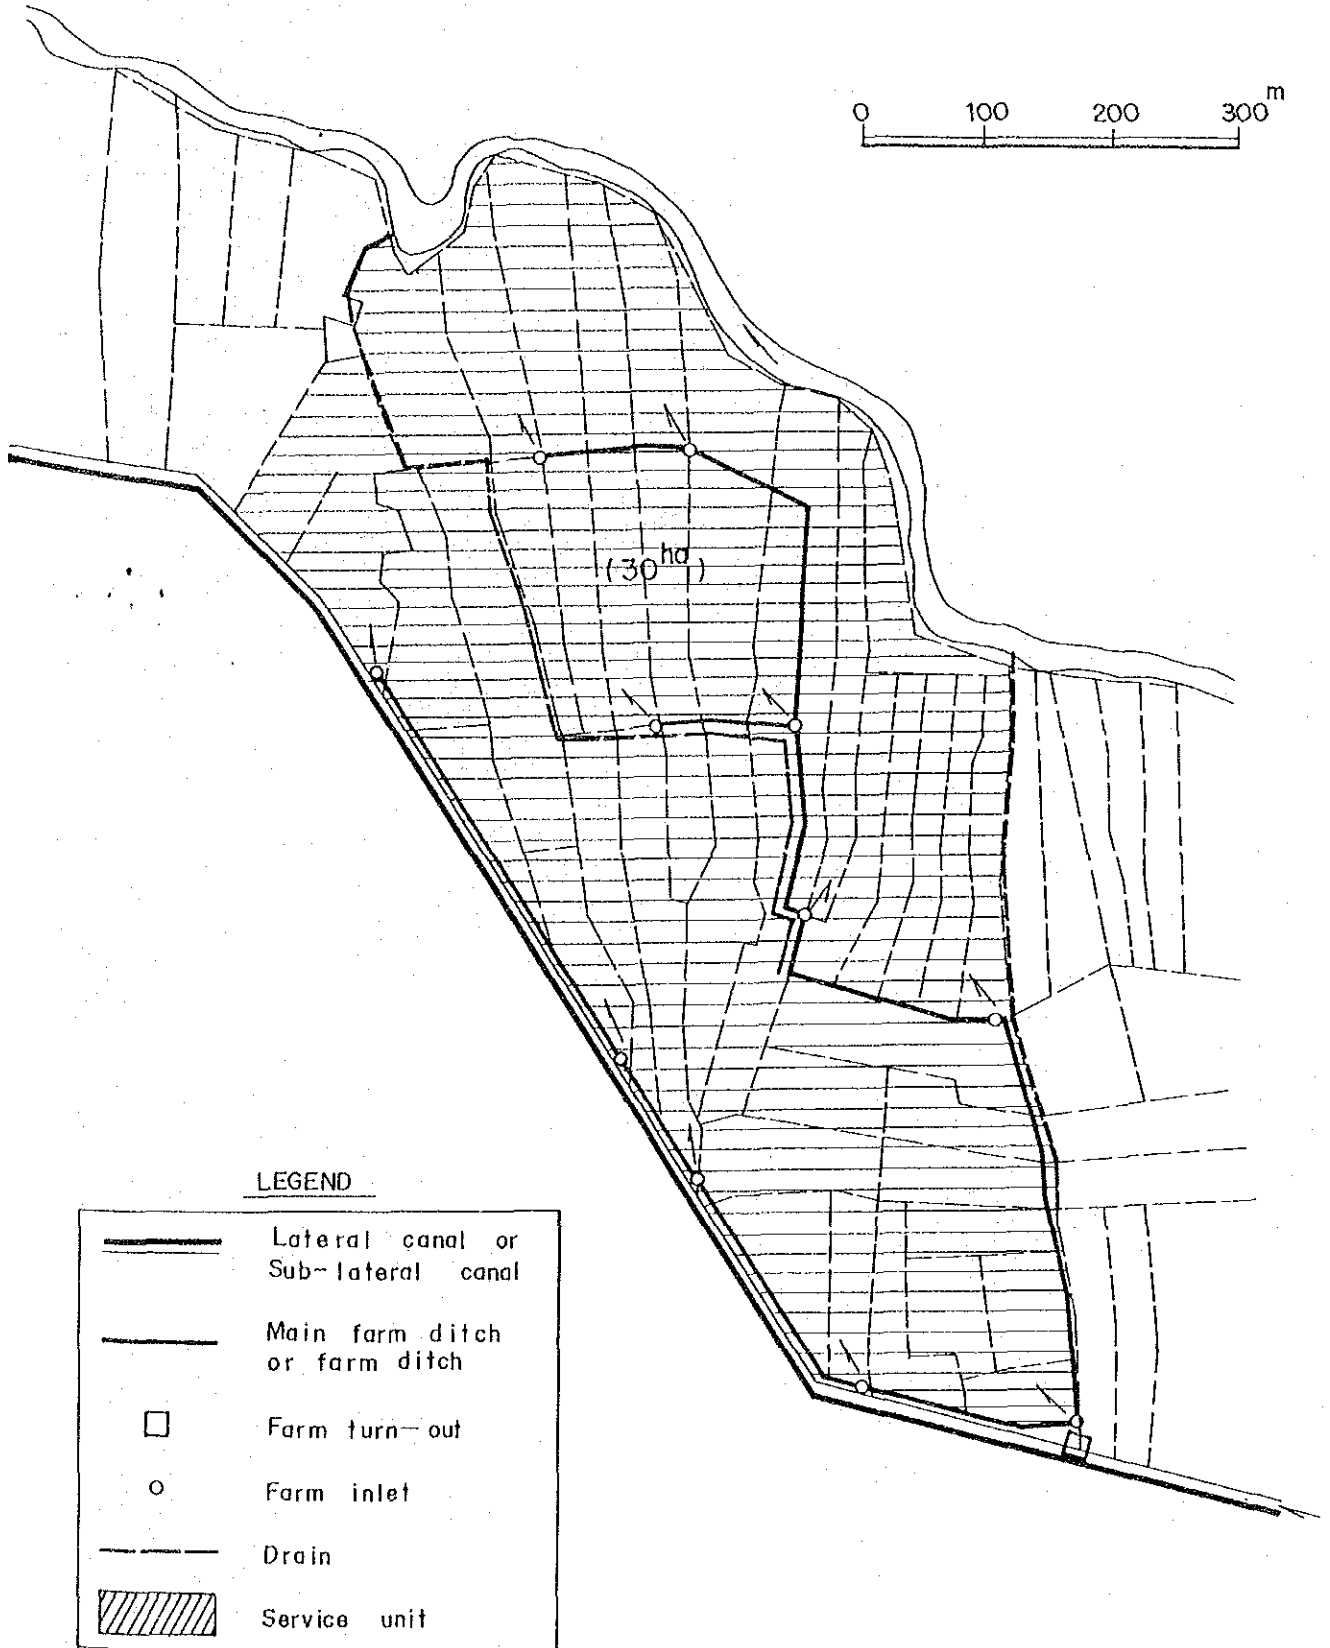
(2) Typical Layout of On-farm Facilities (2/2)
